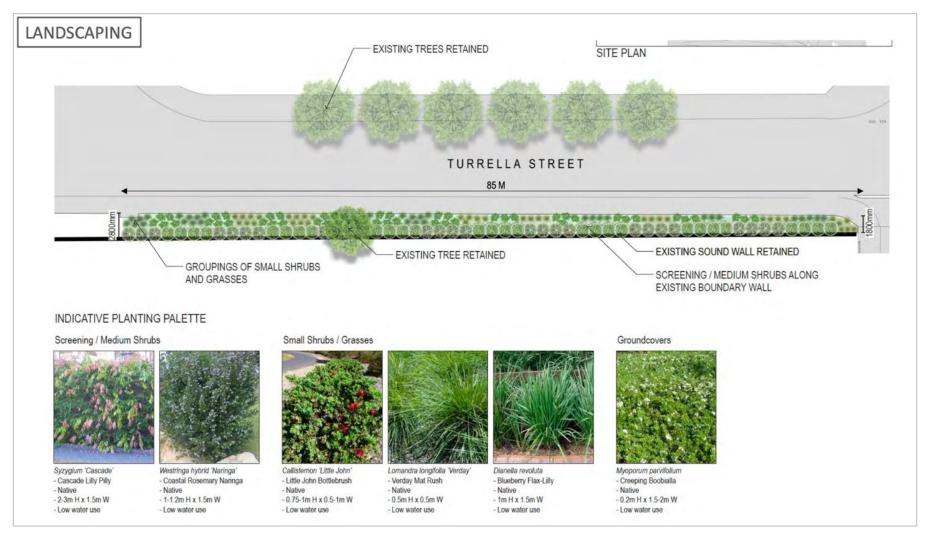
Concept Landscape Plan (indicative only, subject to detailed design)¹⁰
